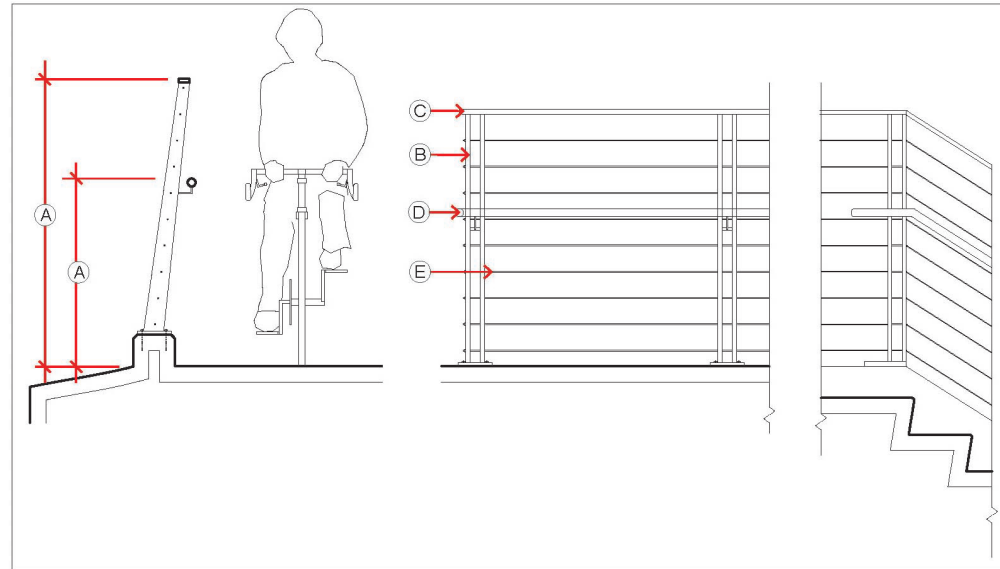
Pedestrian railing type 2 typical section and elevations
